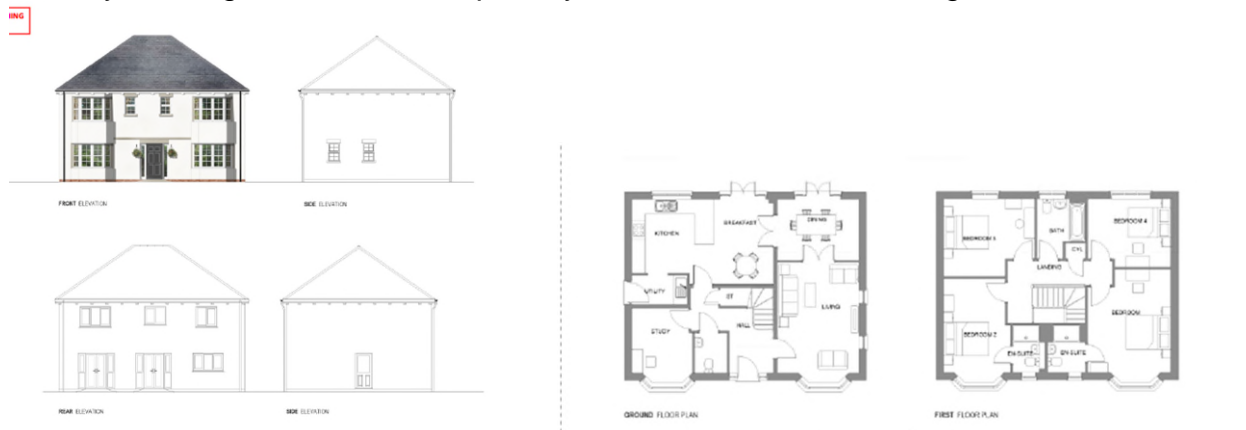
Proposed Elevations and Floor Plans of the Replacement Rectory House Type
